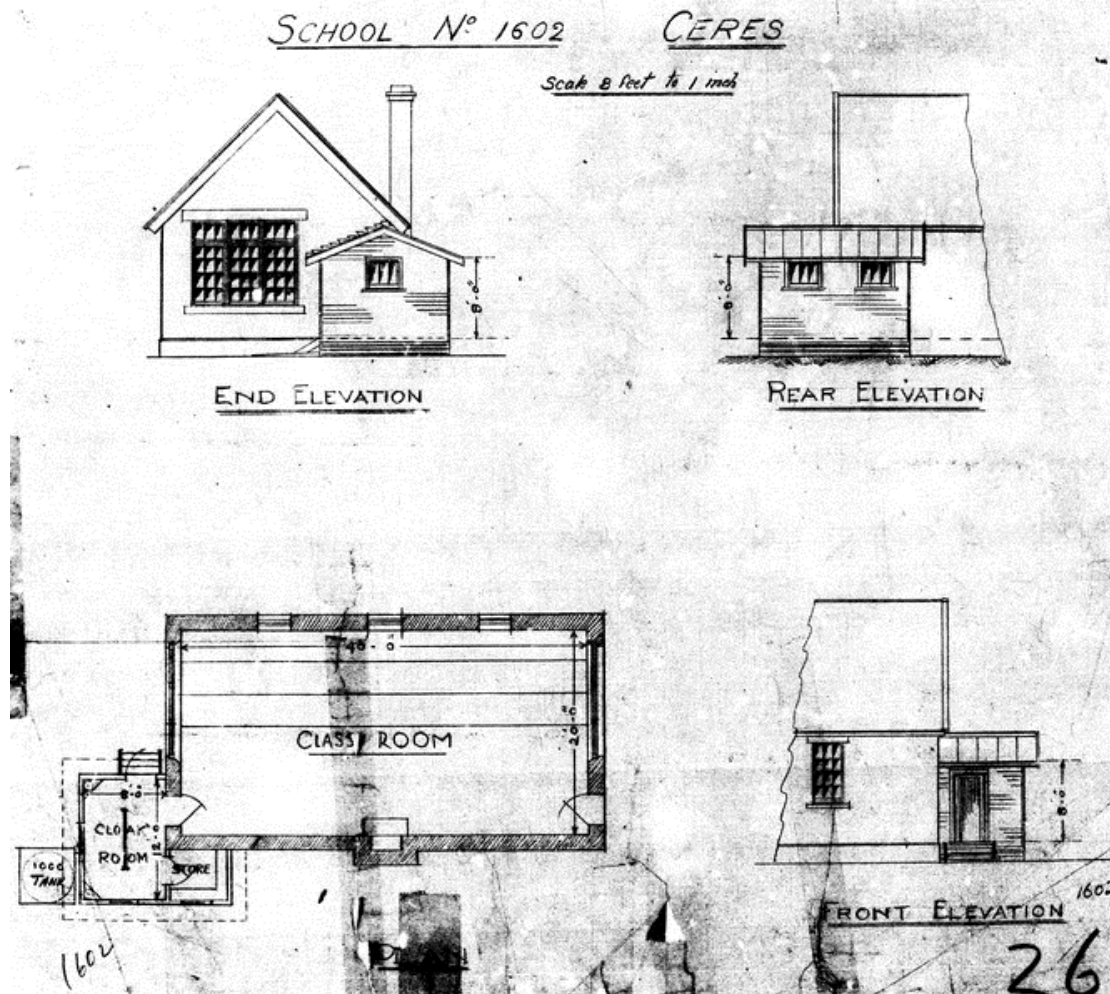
Plan and Elevation Drawings, Ceres State School no. 1602, n.d. (c.1948) showing original roof form and early cloakroom. Source: Drawing SSN 1602.1, Public Record Office Victoria.
